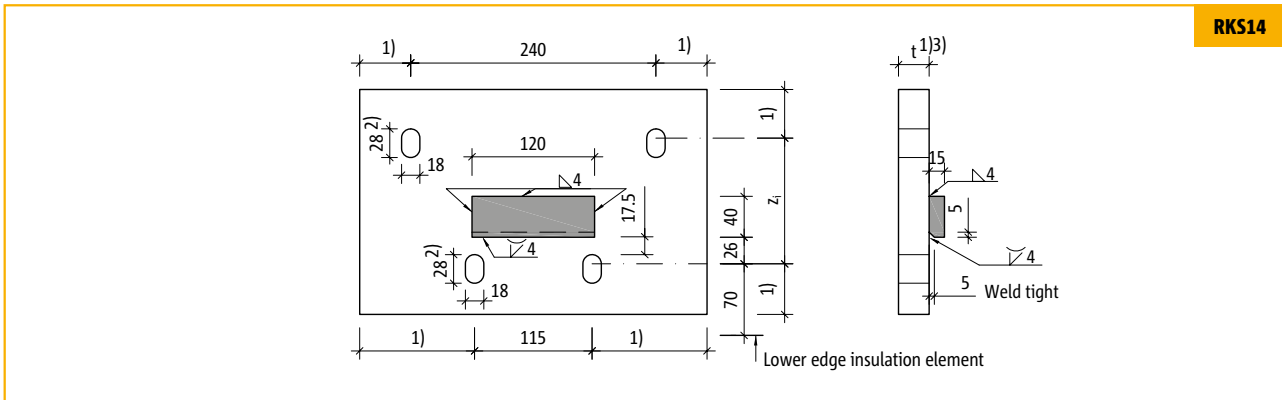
On site face plate for Schöck Isokorb® type RKS14
